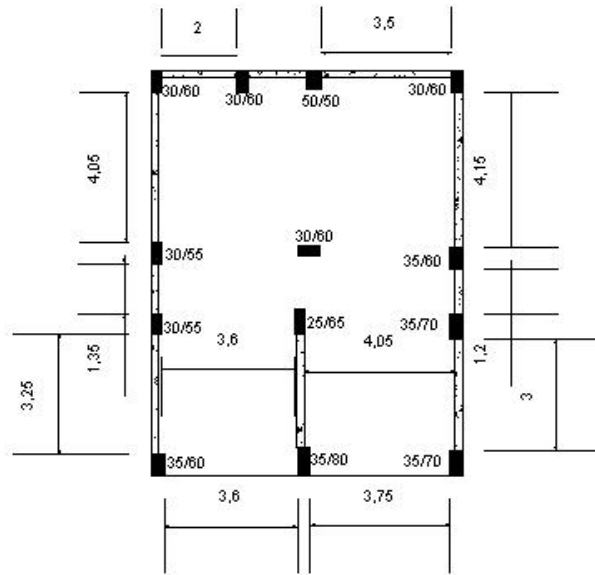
Typical residential building after Bingol Earthquake (BNG-10-5-2)
